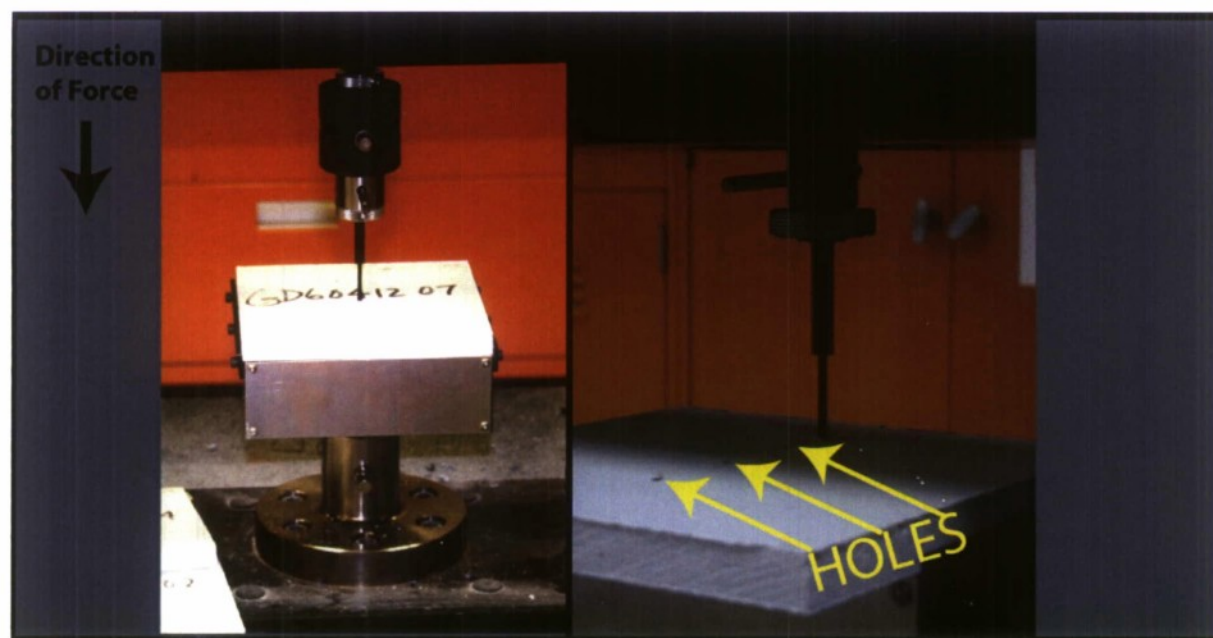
Representative photograph of the gypsum wallboard coupon test.
